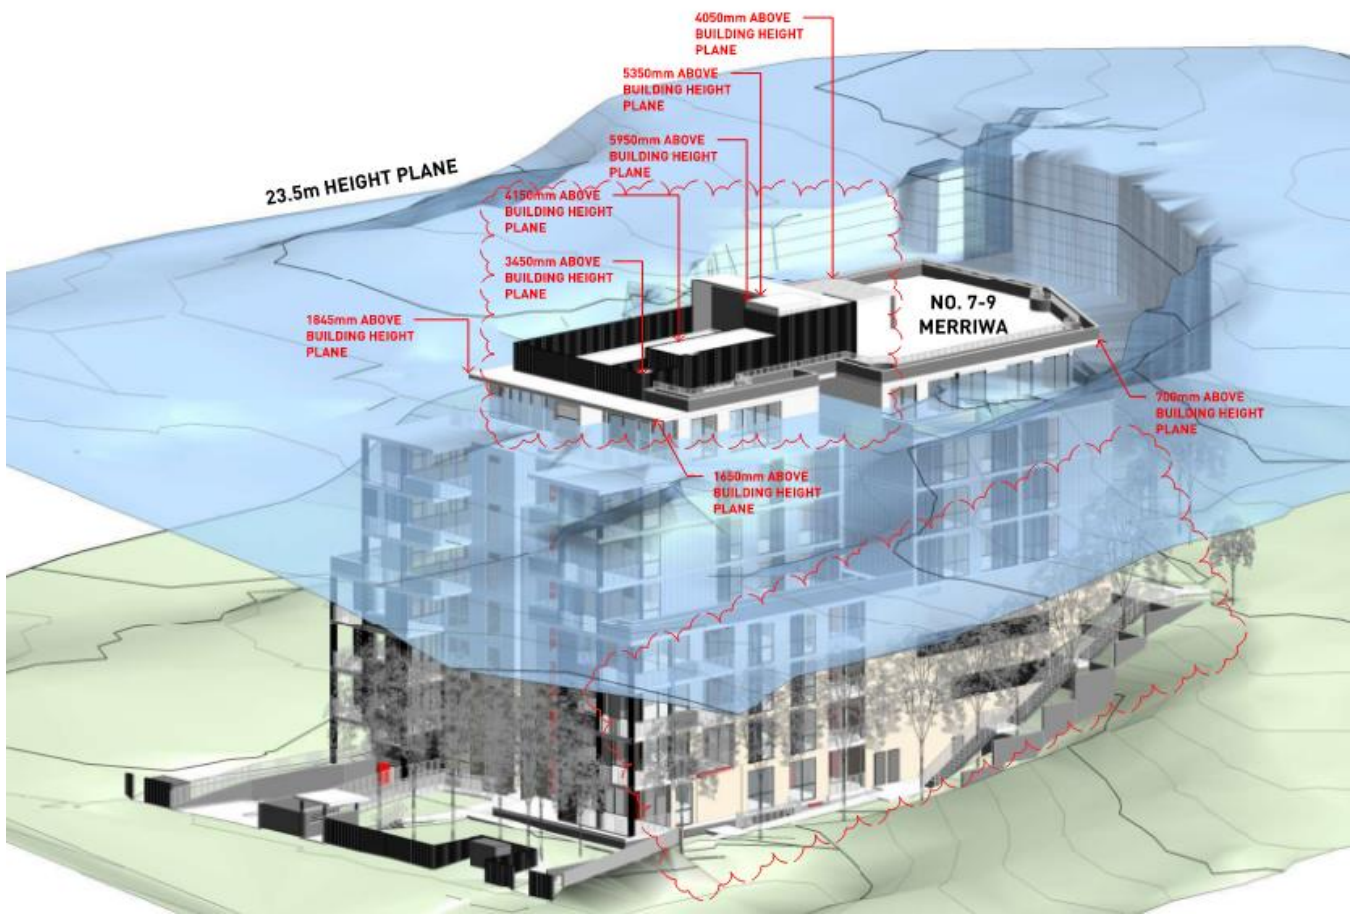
An extract of modelling the architectural plans (based upon an elevated viewpoint to the southeast of the site), showing elements of the proposed development that will breach the 23.5 metre building height development standard (denoted by the blue overlay). The building height development standard portrayed by this image is based on existing levels, which are associated with prior development that has heavily modified the subject site's topography. Note: This information has been provided for reference only, and in accordance with relevant caselaw should not be used to assess the proposed height of the development. Source: Giles Tribe, 2024
